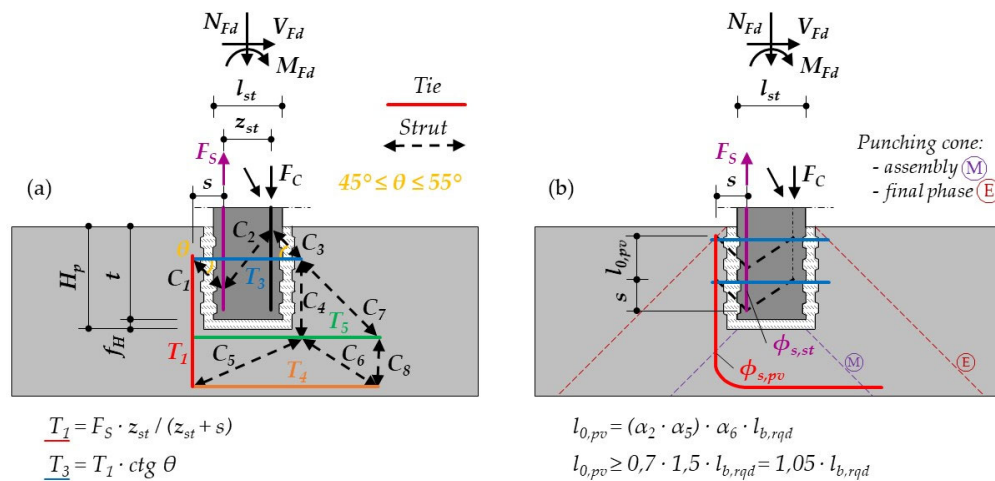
Calculation model for pedestal pocket foundation (with precast socket and monolithic slab foundation) with keyed internal walls: (a) Strut-and-tie model and (b) Vertical reinforcement
